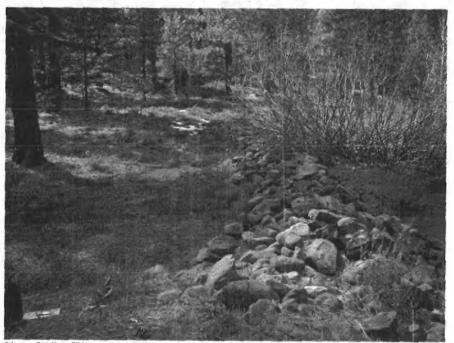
, Wing Dam Segment 1, north of Road 860, view from grade bed to the west.
